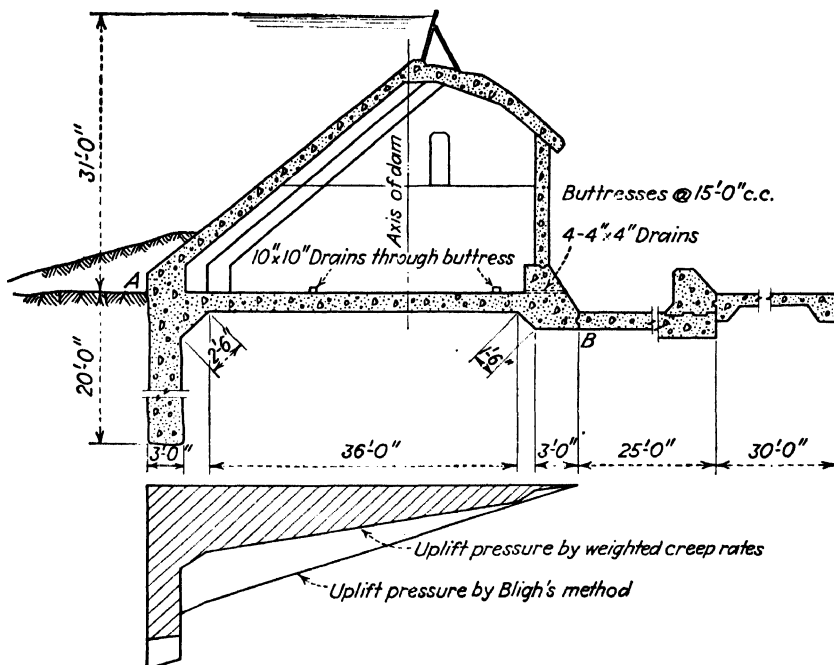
Sebasitcook River Dam. Section through spillway with line of creep—Lane and Bligh.
